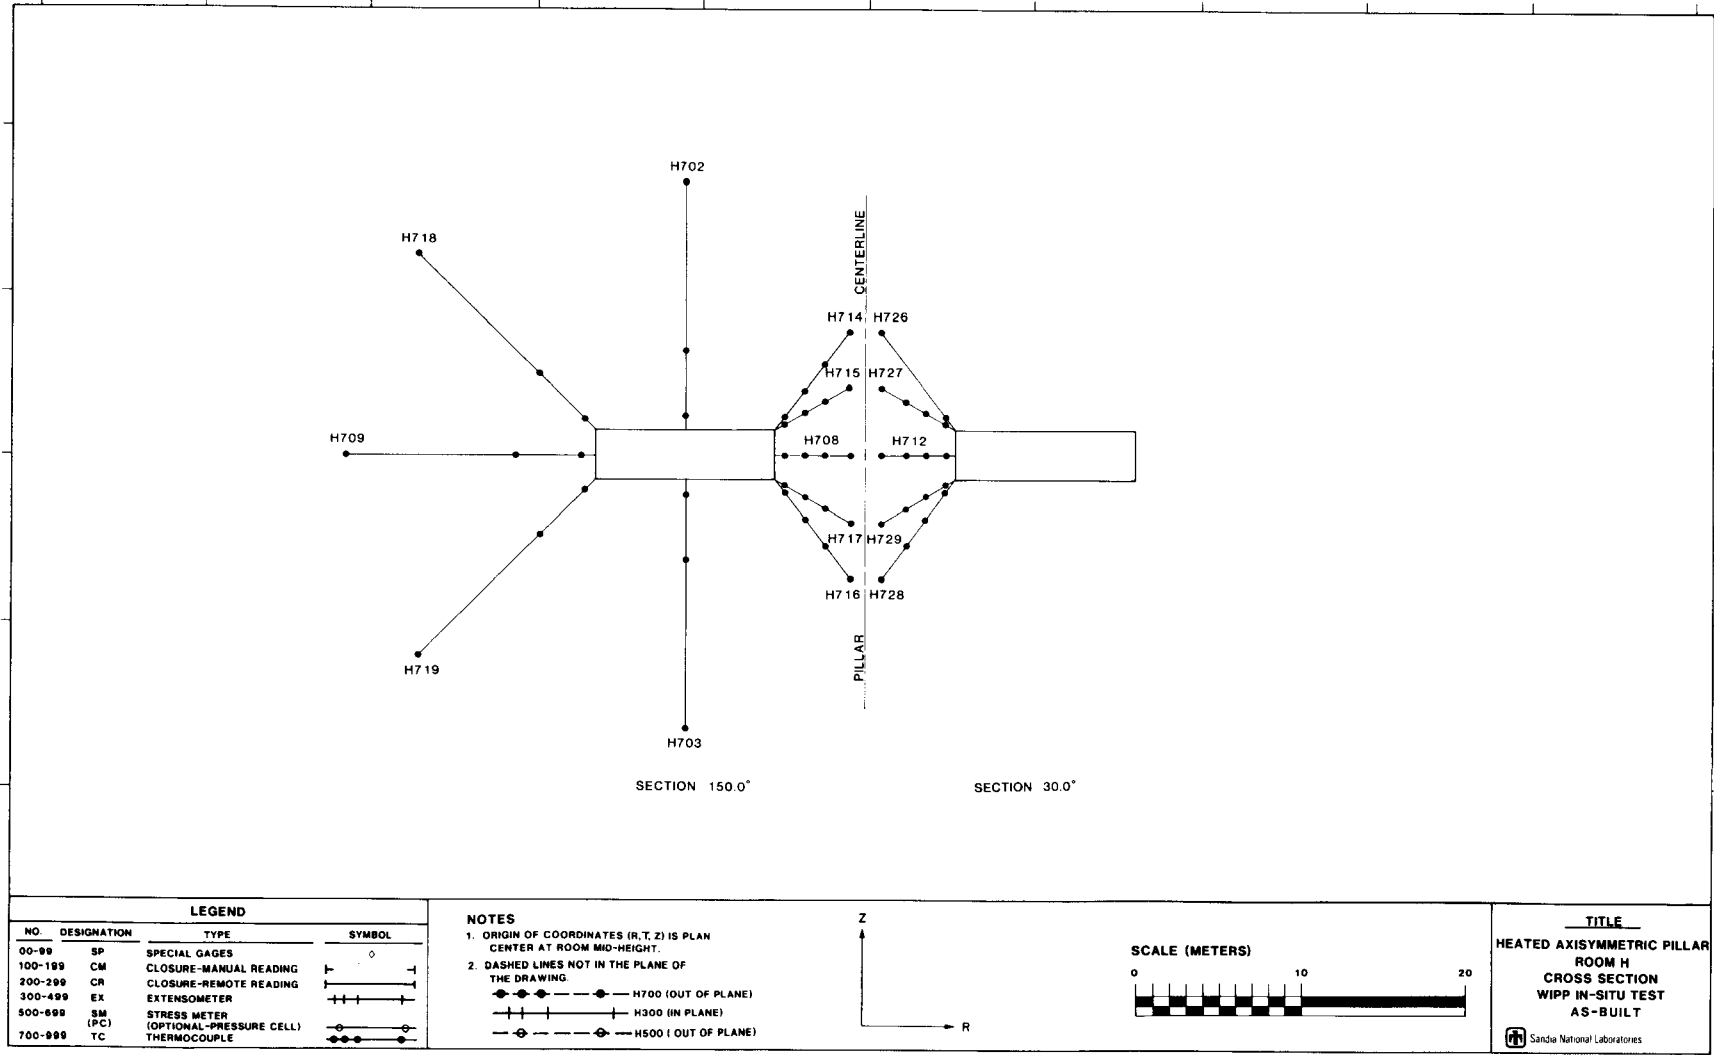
Cross Section of 30° and 150° Instrument Stations
